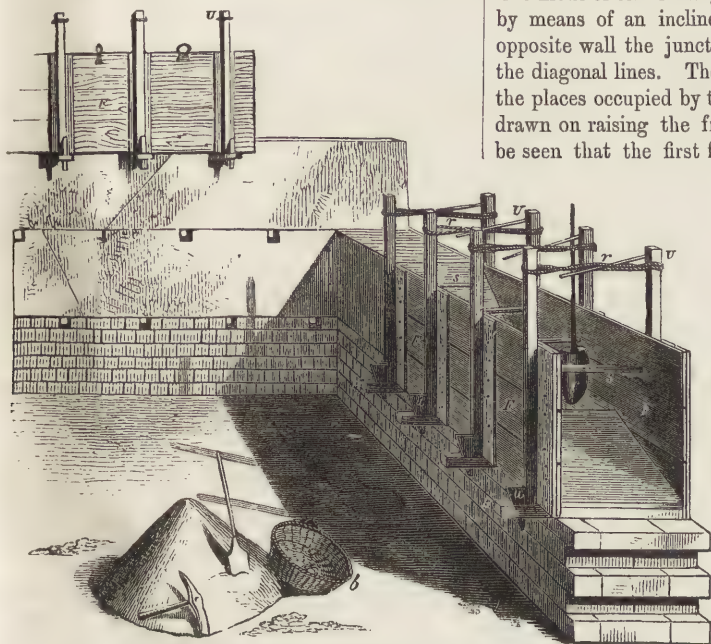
PROCESS OF BUILDING A WALL IN PISÉ.
